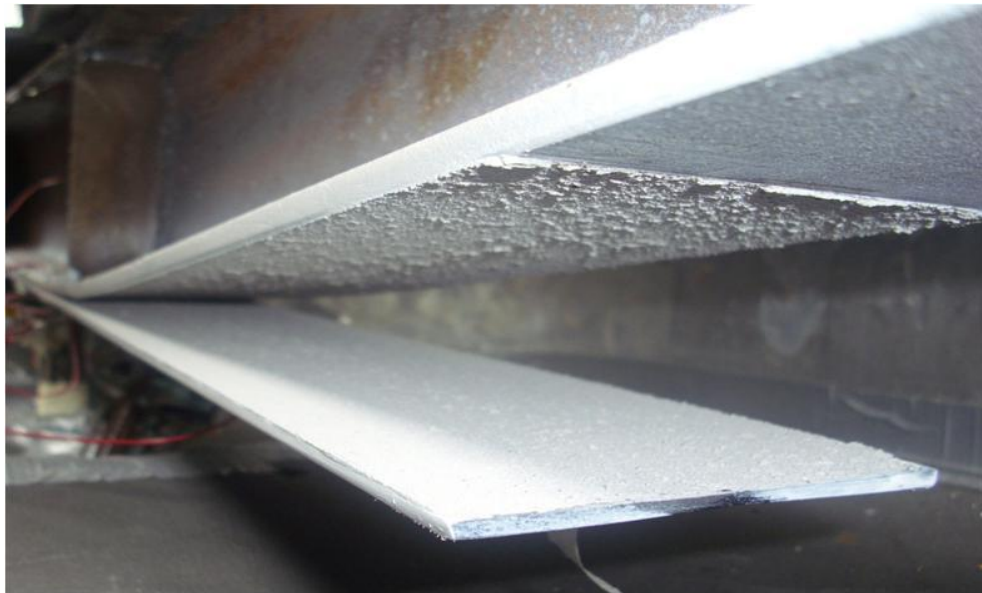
Adhesive epoxy degraded at 60 °C leaving a thin layer on the steel beam
